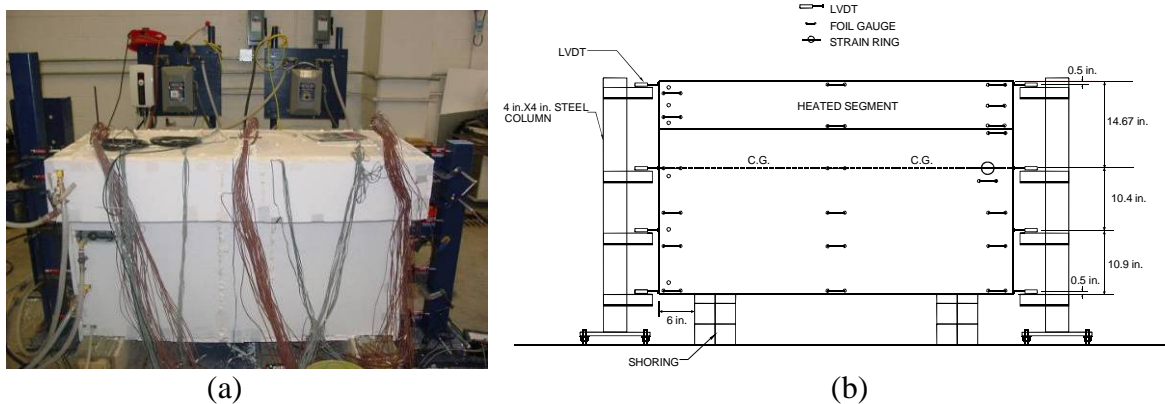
In-situ CTE test setup; (a) Photograph, (b) Details
